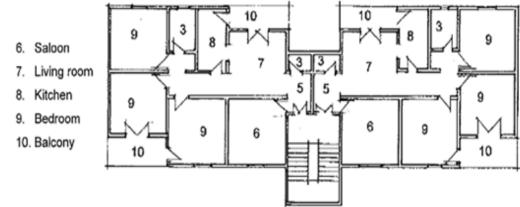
Plan of the models of one of government flats buildings in Sabha
